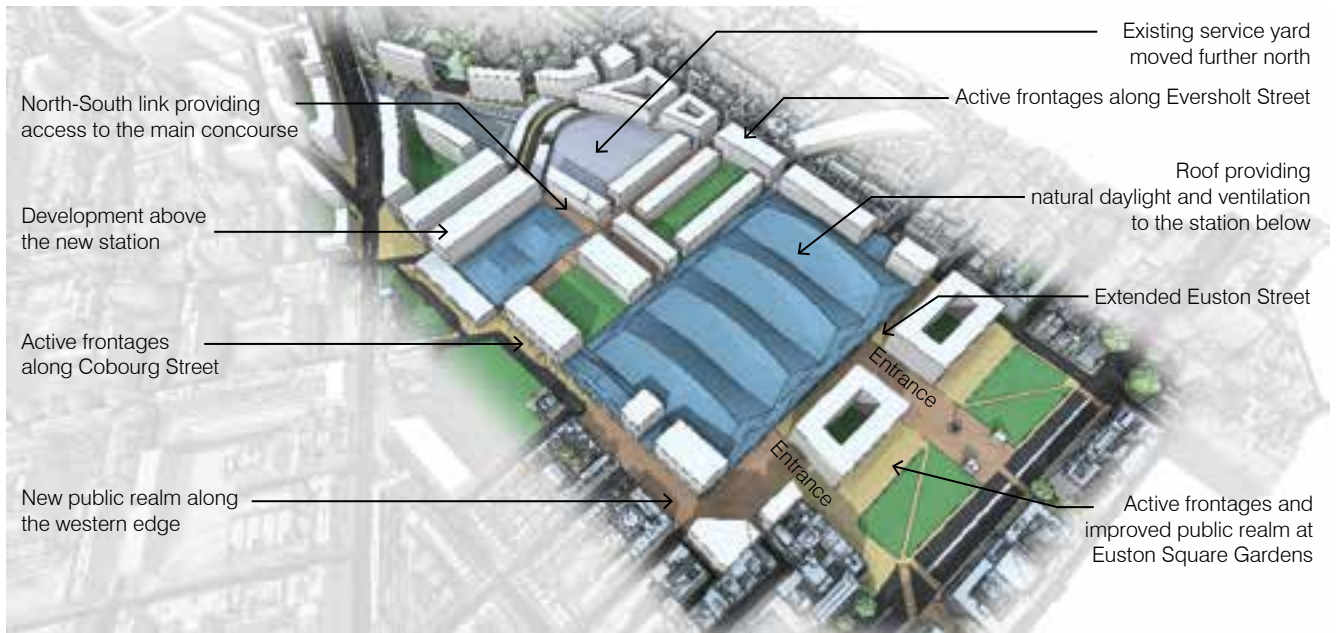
Illustrative 3D model of the proposed station with over-station development
